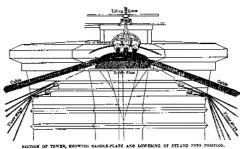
Old East River Bridge—Section of Tower, Showing Saddle.
